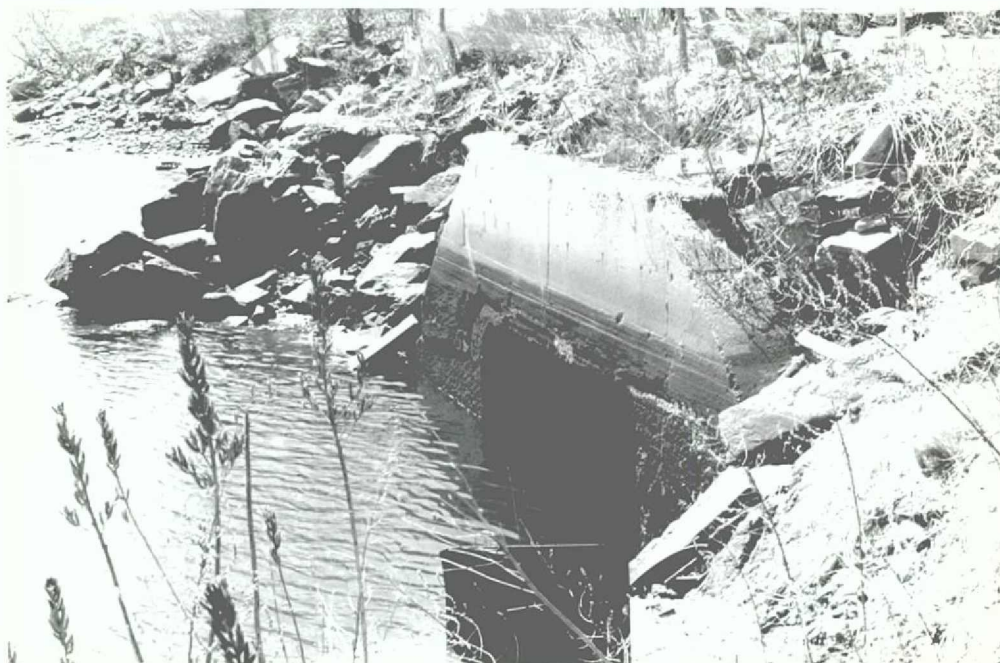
Bedrock Outcrop, DOT Site 1A, Facing West
